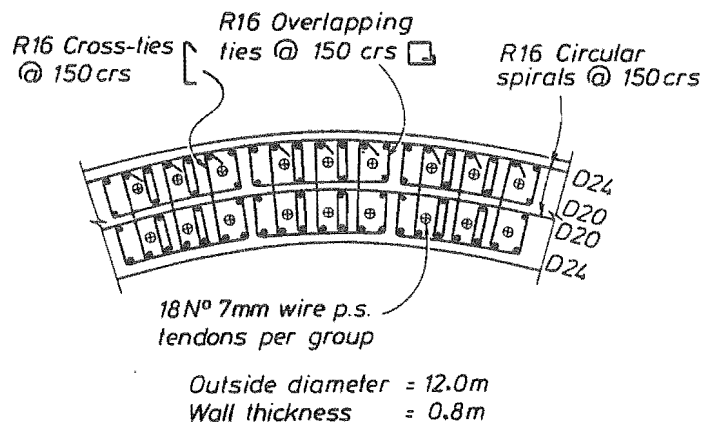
North Sea Type Platform Reinforcement Layout at Leg Base Section
